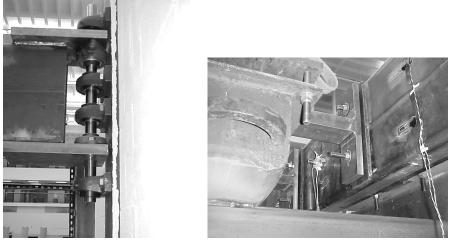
(a) Diaphragm beam to in-plane wall connection detail. (b) Diaphragm beamto-diaphragm mass connection detail.
